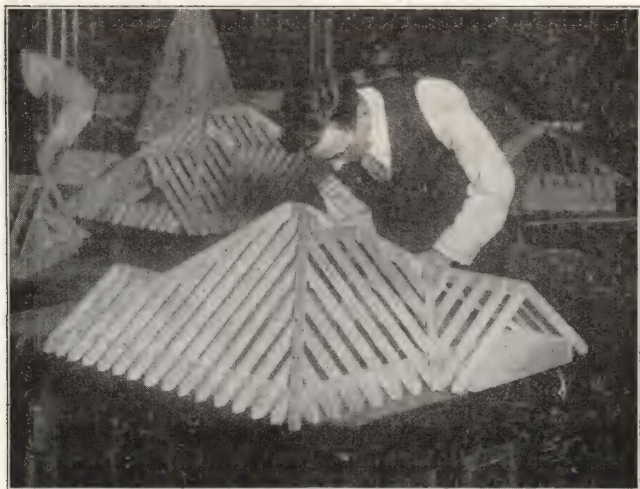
Rear and Left Side Elevation, Problem 5, Showing the Method of Framing the Rafters
